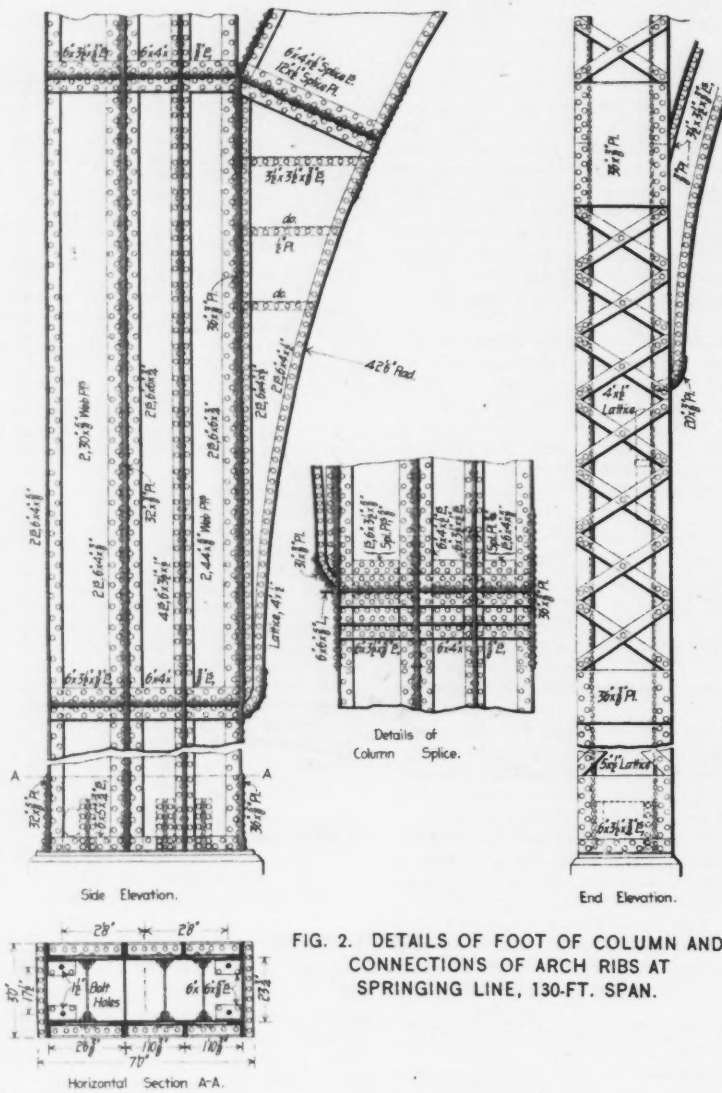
DETAILS OF FOOT OF COLUMN AND CONNECTIONS OF ARCH RIBS AT SPRINGING LINE, 130-FT. SPAN.
